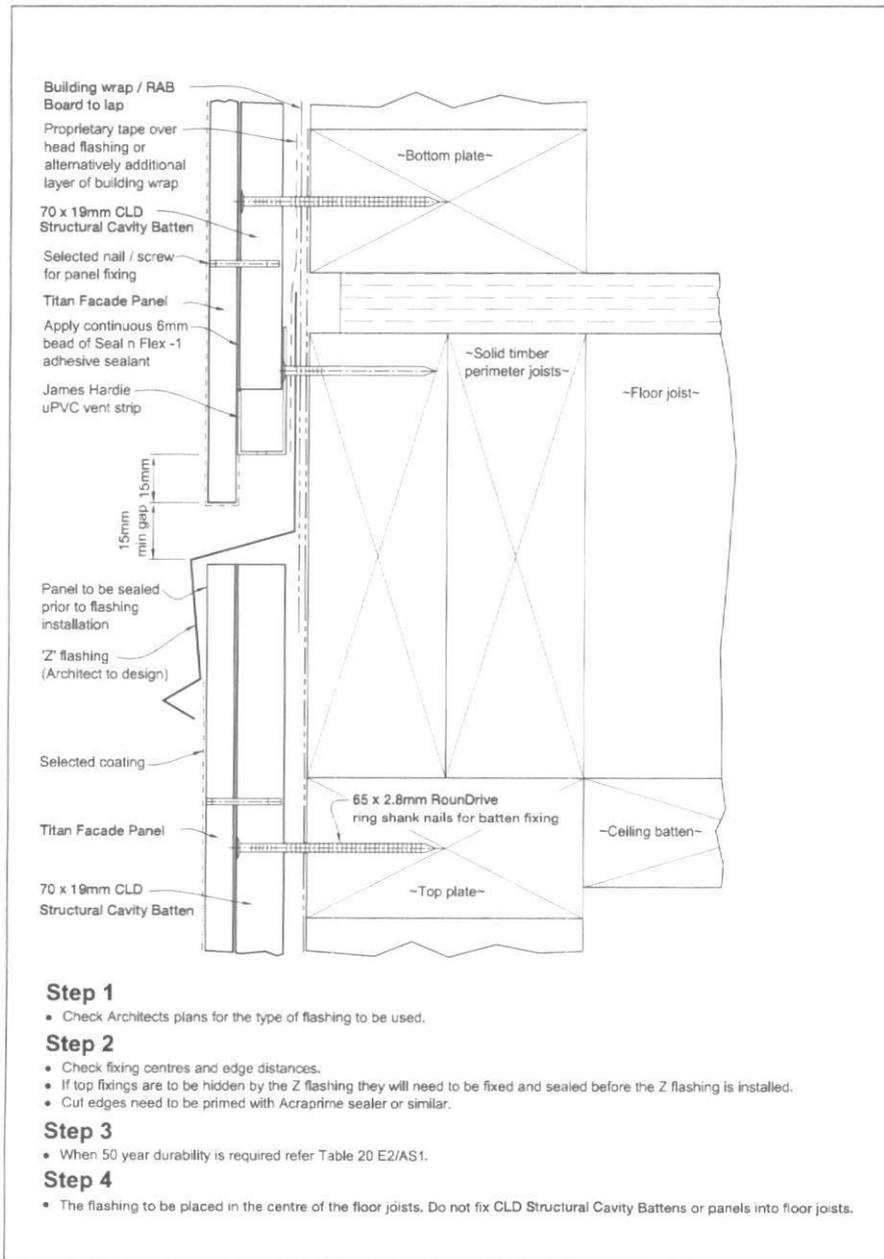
DRAINED FLASHING JOINT AT FLOOR JOIST
